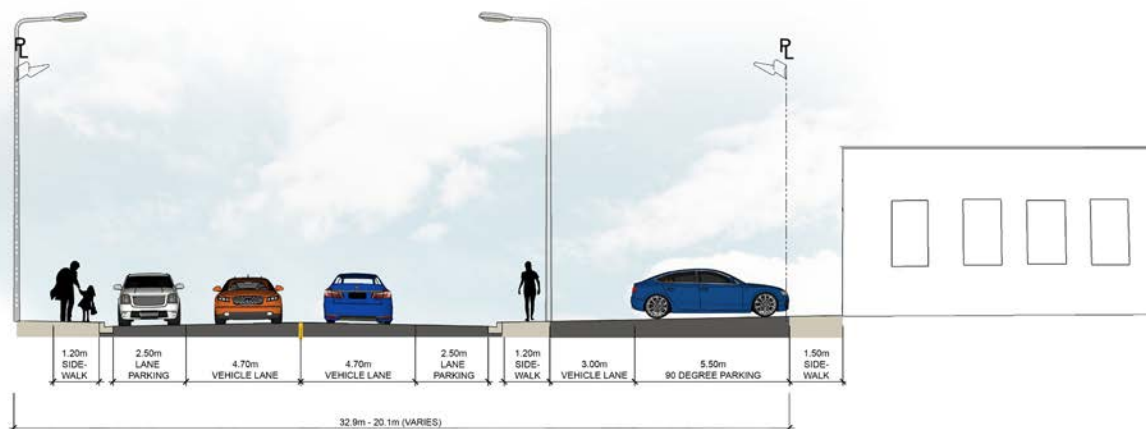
THE CORE (45 STREET TO 46 STREET N.W.) SECTION - EXISTING CONDITION
